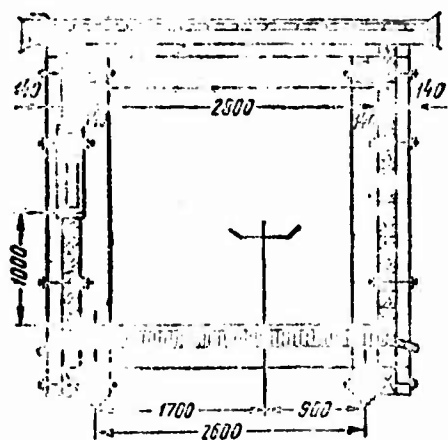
Section of a gallery with wooden trusses (applies to Fig. 253).
